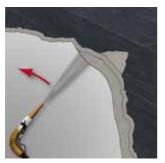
2nd shotcrete layer – excavation stabilization, usually together with steel reinforcement
